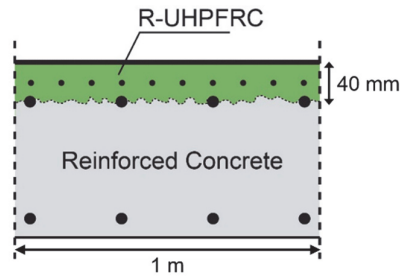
\_ A typical cross-section of an RC slab strengthened with UHPFRC
